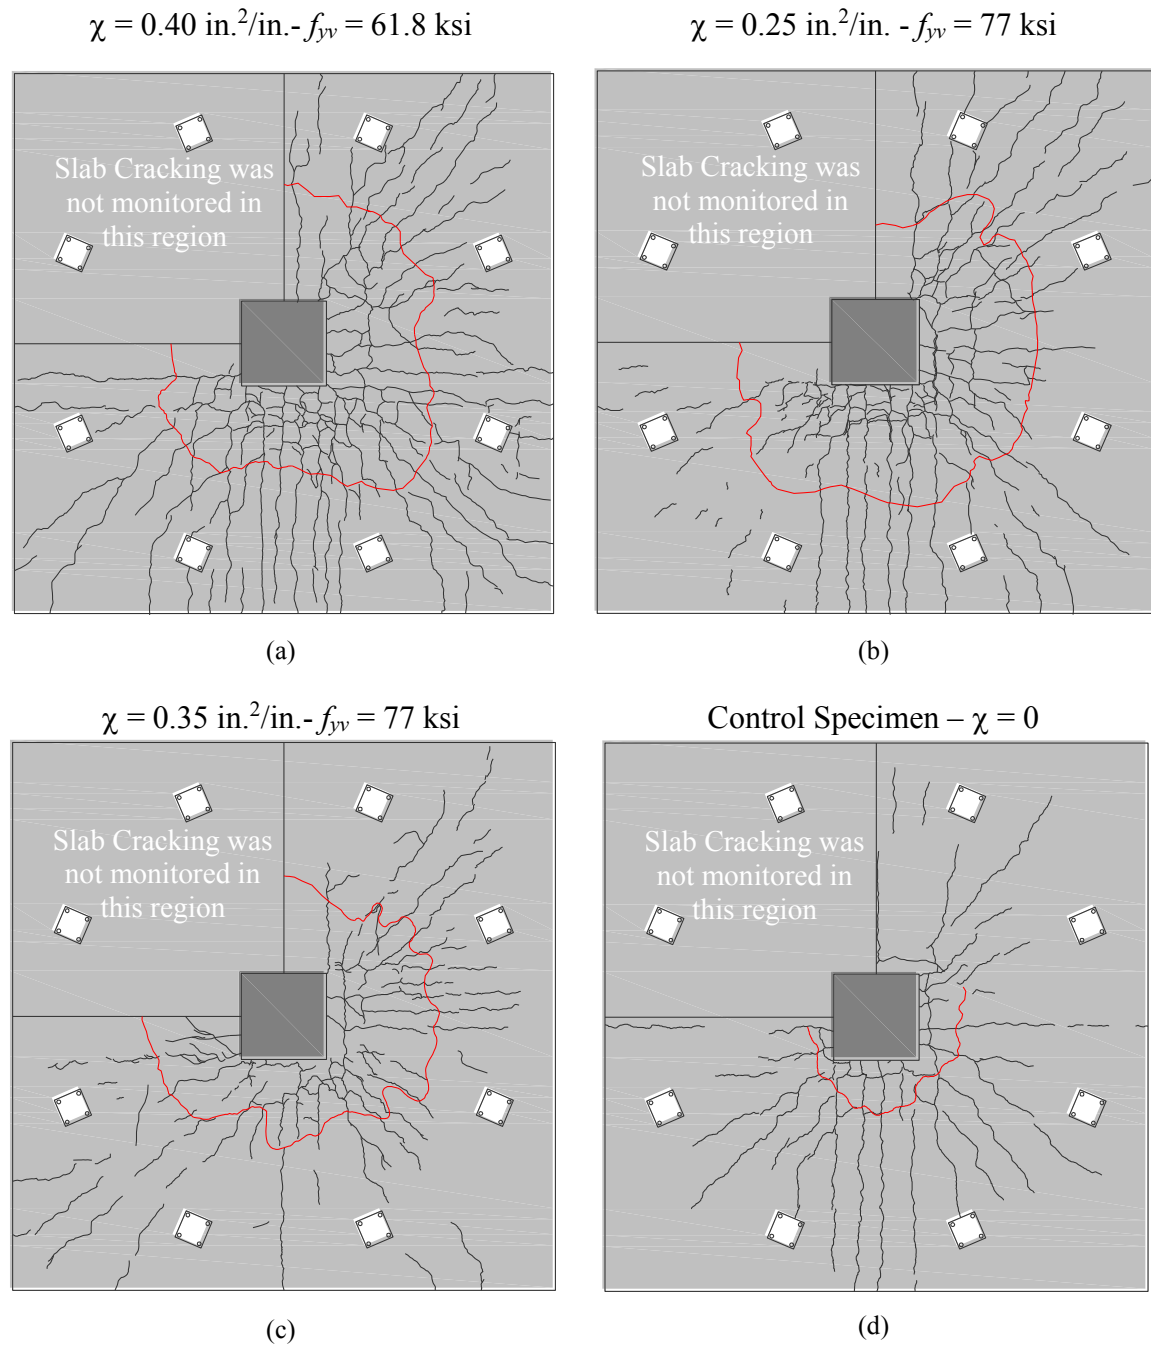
Observed Cracking Patterns at Failure; (a) Slab 1, (b) Slab 2, (c) Slab 3, (d) Slab 4
